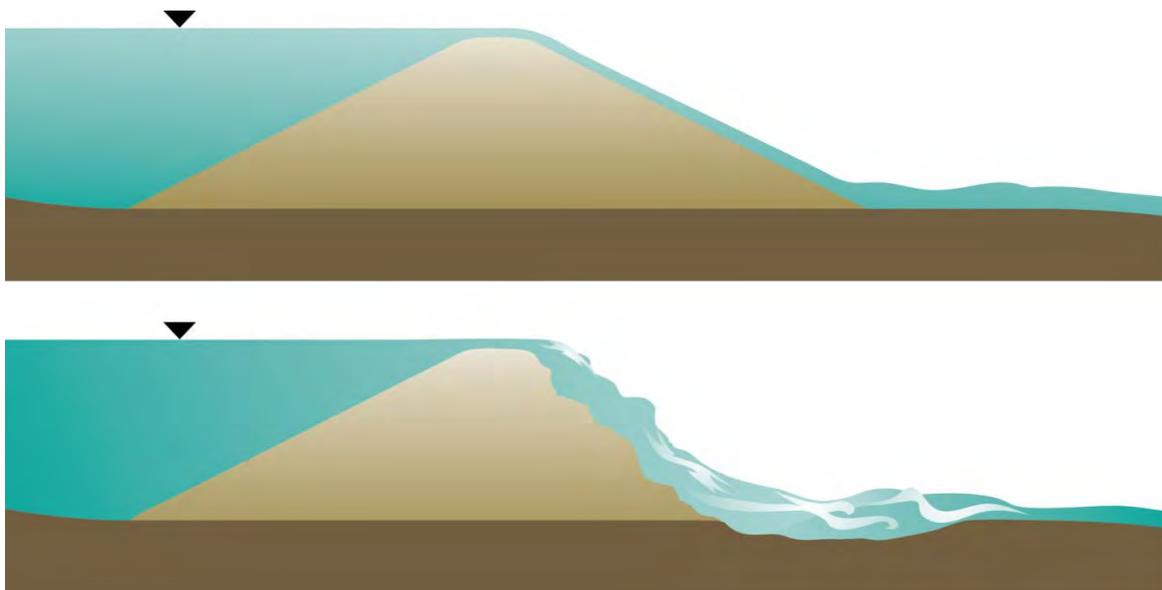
Erosion on the downstream face of a cohesive soil embankment dam (Powledge et al. 1989)
